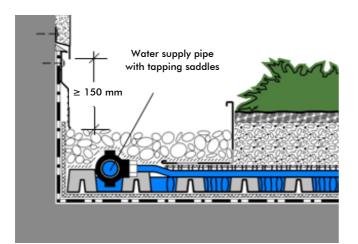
Wall connection with gravel strip and Eaves Profile DP 120; Dripperlines installed orthogonally to the wall
